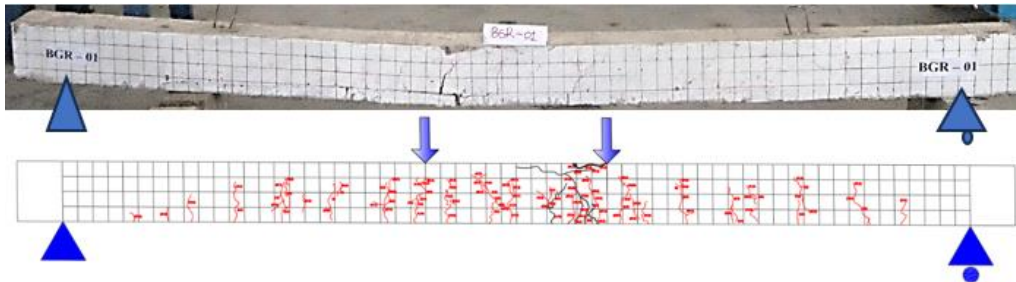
Crack Pattern of Concrete Block RBGR
